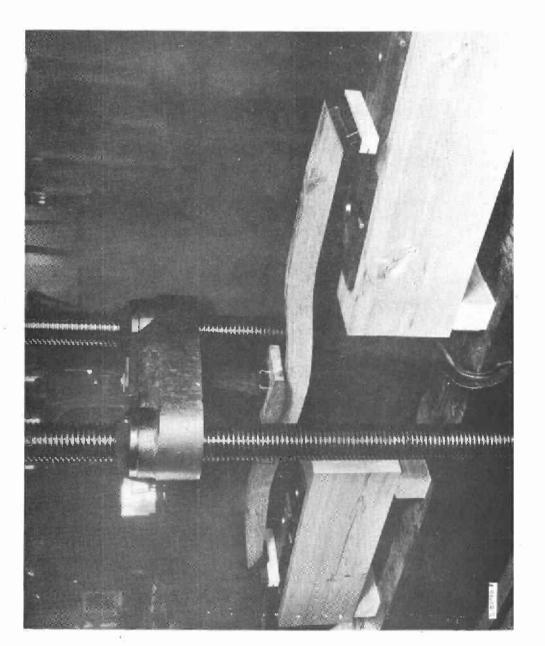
Steam-bent frame in testing machine showing degree of bend prior to complete failure under transverse loading.
